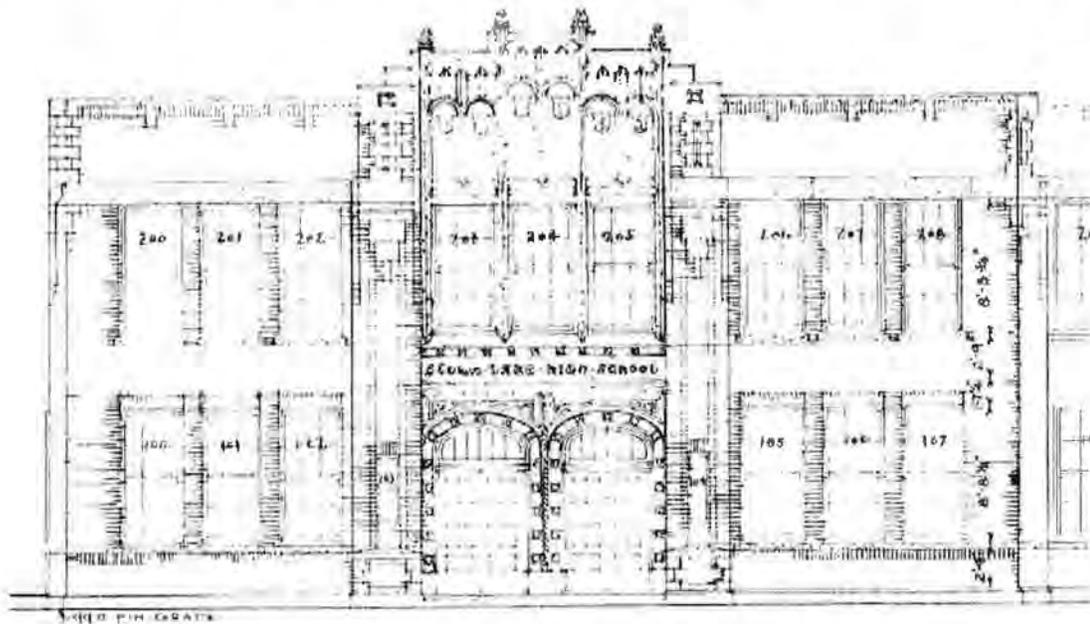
Architect plans for main entrance block, south end of the east façade. Collection of the school district.
